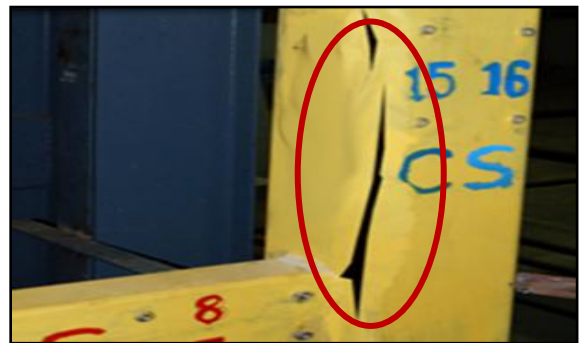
Tearing of Column at a Base Shear of 130 kN–Frame (2)
